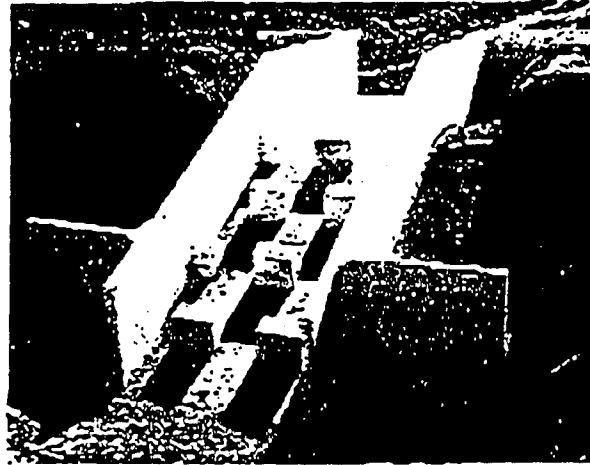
Baffled apron drop with wingwalls located upstream from the outlet end. P-492-701-1102A
